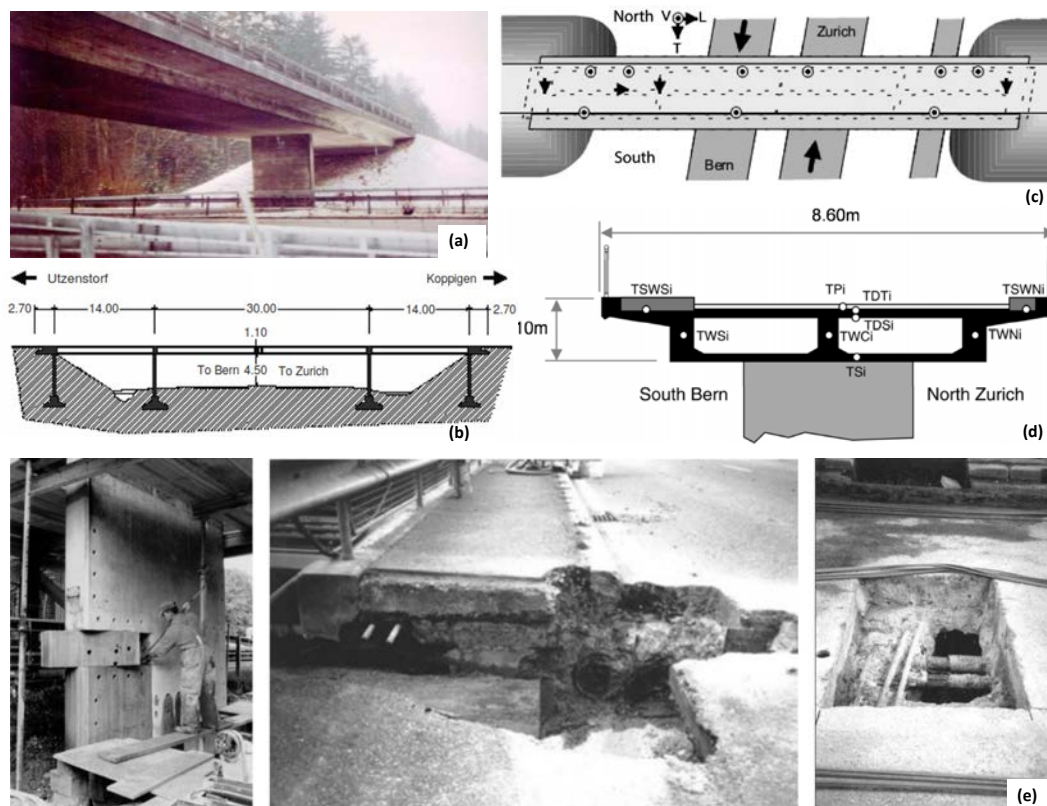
The Z-24 Bridge (a) side view and (b) longitudinal section. Acceleration sensor's locations (c) cross-section and (d) location of the thermocouples (e) damage scenarios carried out in the Z-24 Bridge; left to right: pier settlement, failure of anchor heads, and tendon rupture. Adapted from [33].
